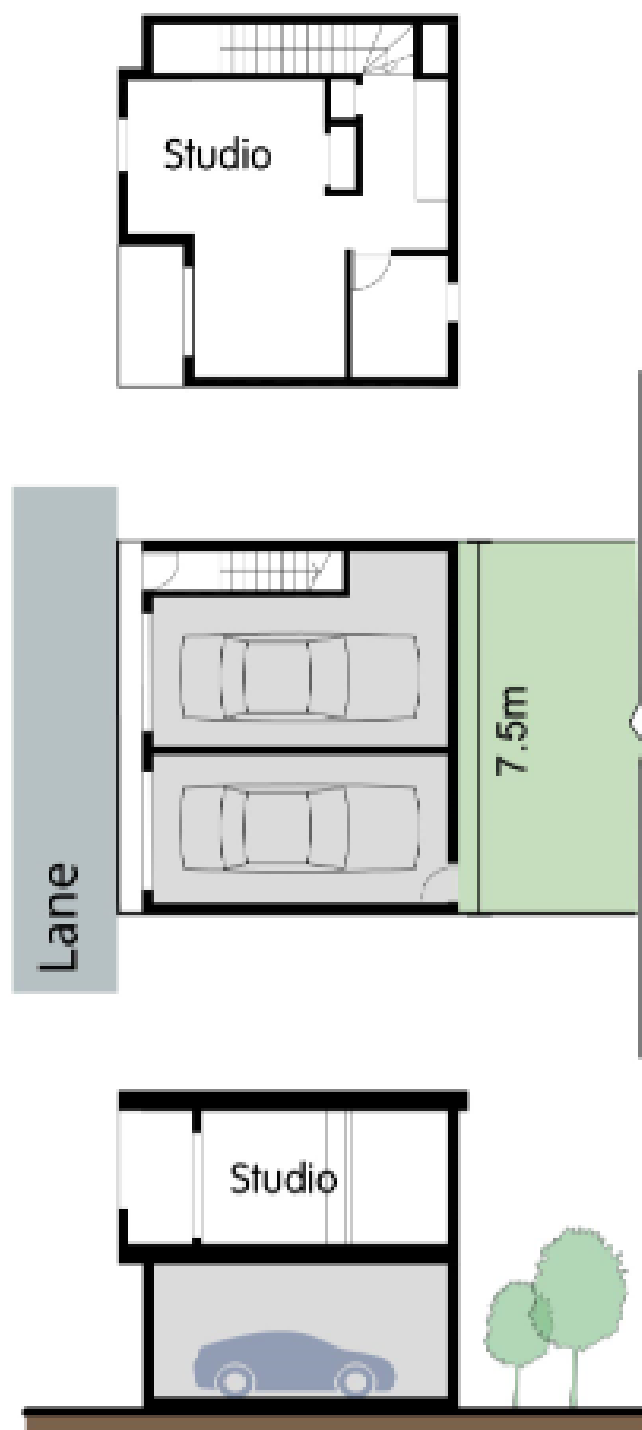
Typical Studio Dwelling Typology with One Parking for Terrace and One Parking for Studio
